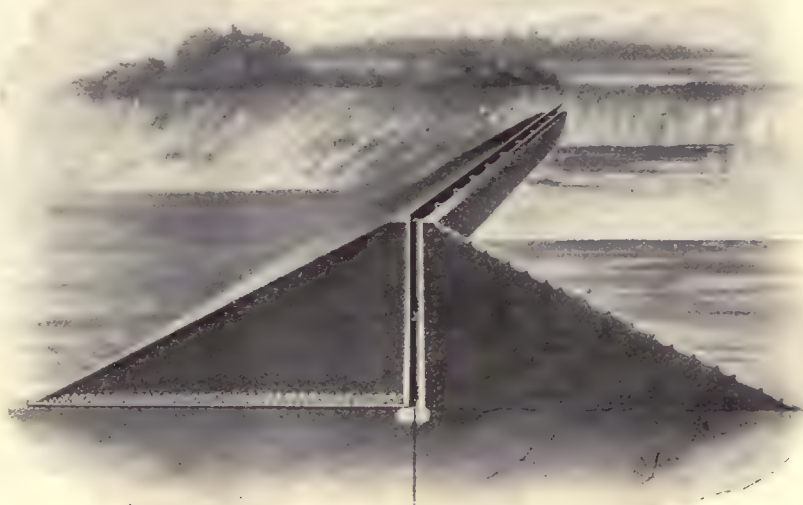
Earth Dam with Hollow Core Wall and Drains.
